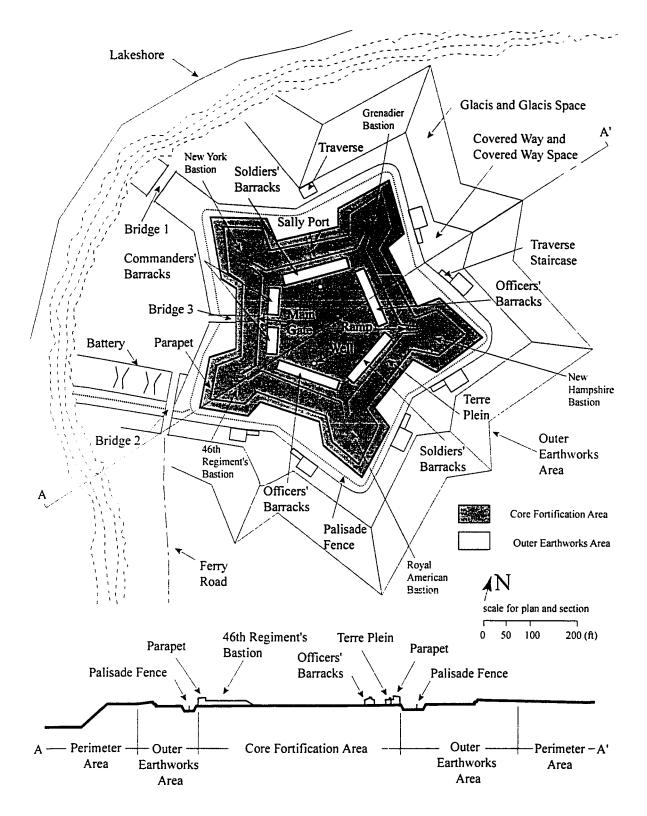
Plan and section of Core Fortification and Outer Earthworks area showing various buildings, structures and small-scale features. Based on plan, "Plan of Fort Ontario," Captain Thomas Sowers, 1763. Graphic produced by R. Hetzler, SUNY ESF, 2003.
